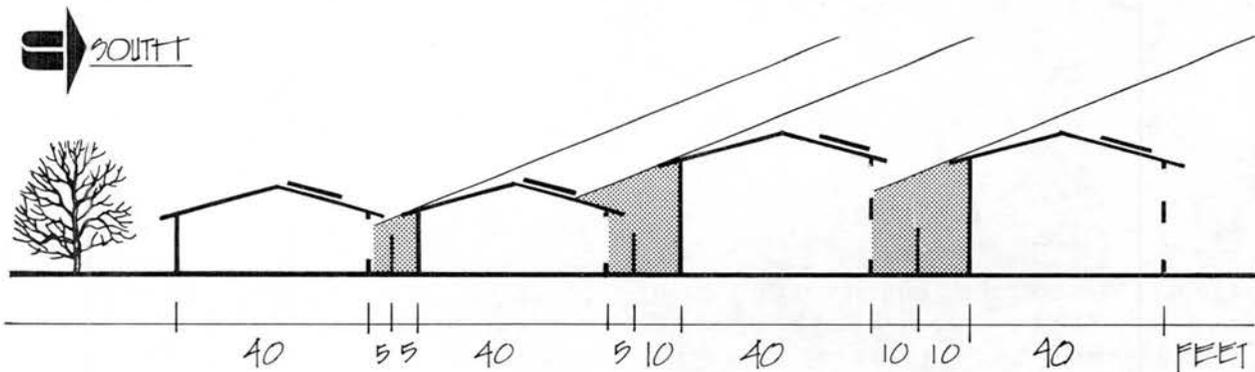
Solar Access on A Typical Suburban North-South Street with Sideyard Setbacks
